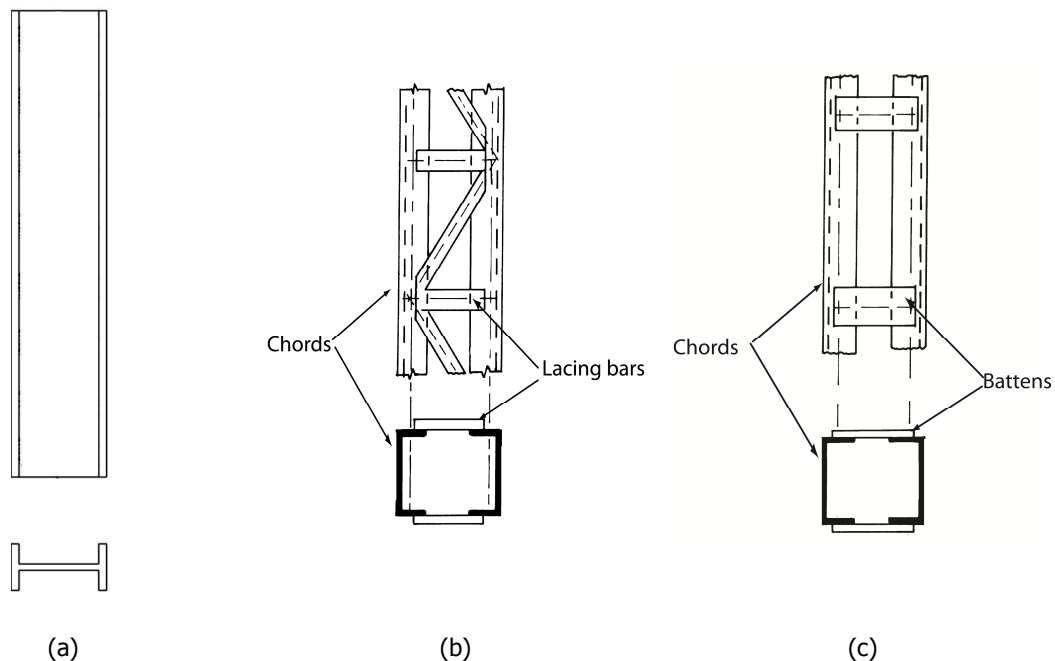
(a) I-profile column (b) laced built-up column and (c) battened built-up column
